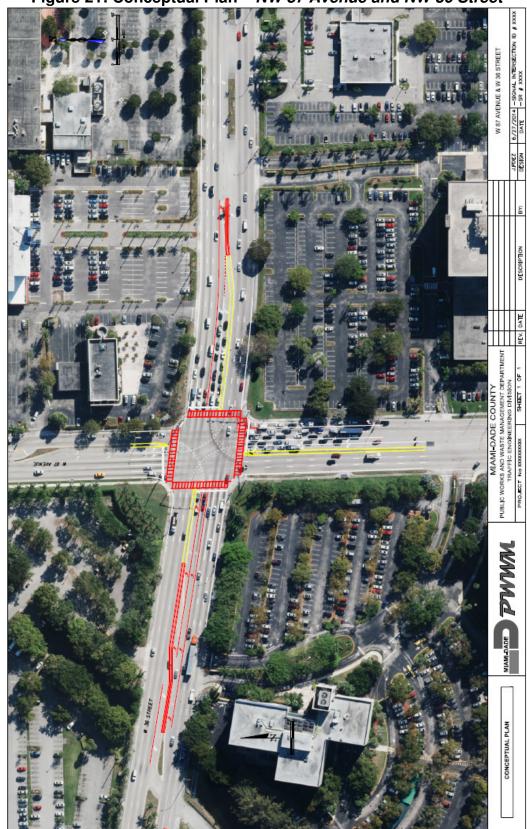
Conceptual Plan – NW 87 Avenue and NW 36 Street
